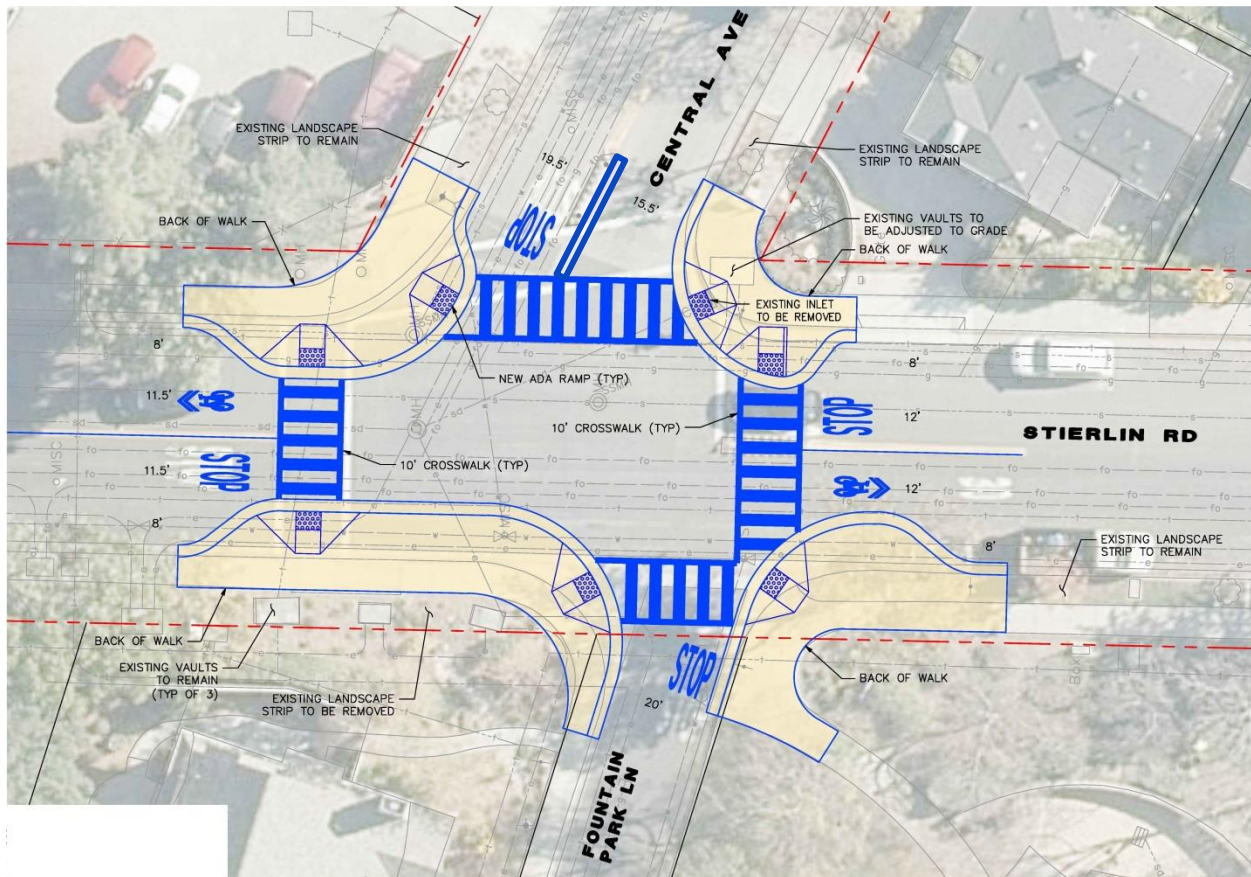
Recommended Concept for Bulb-Outs on Central Avenue and Stierlin Road
